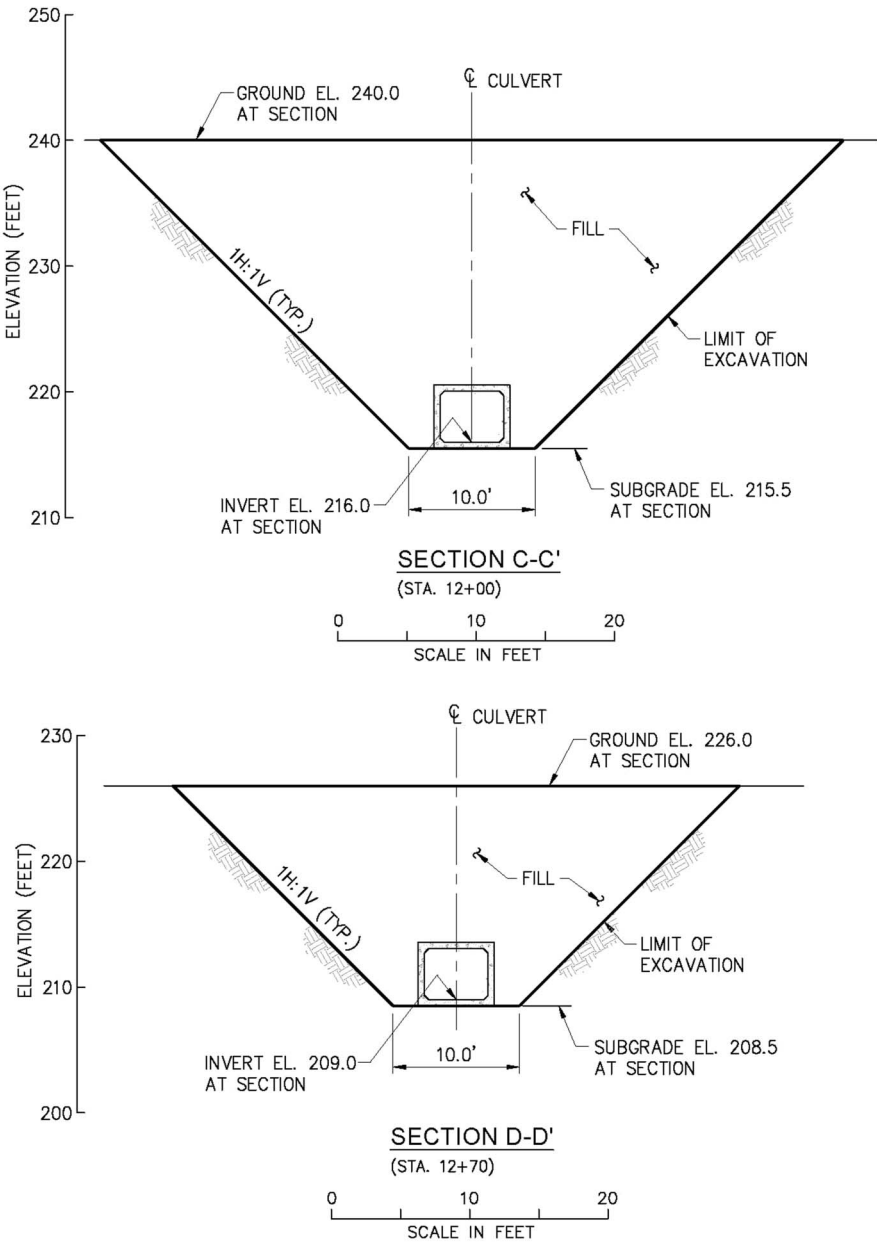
S-1. Culvert Sections at Sta. 12 + 00 and 12 + 70
